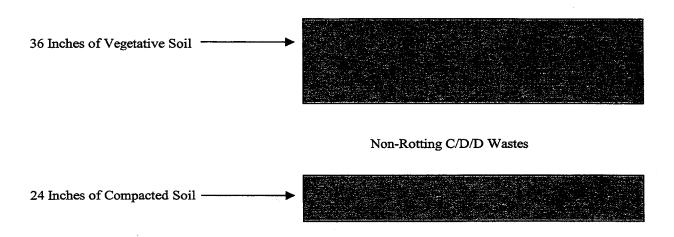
Construction/Demolition/Debris Landfill Non-Putrescible Wastes Design Cross Section
